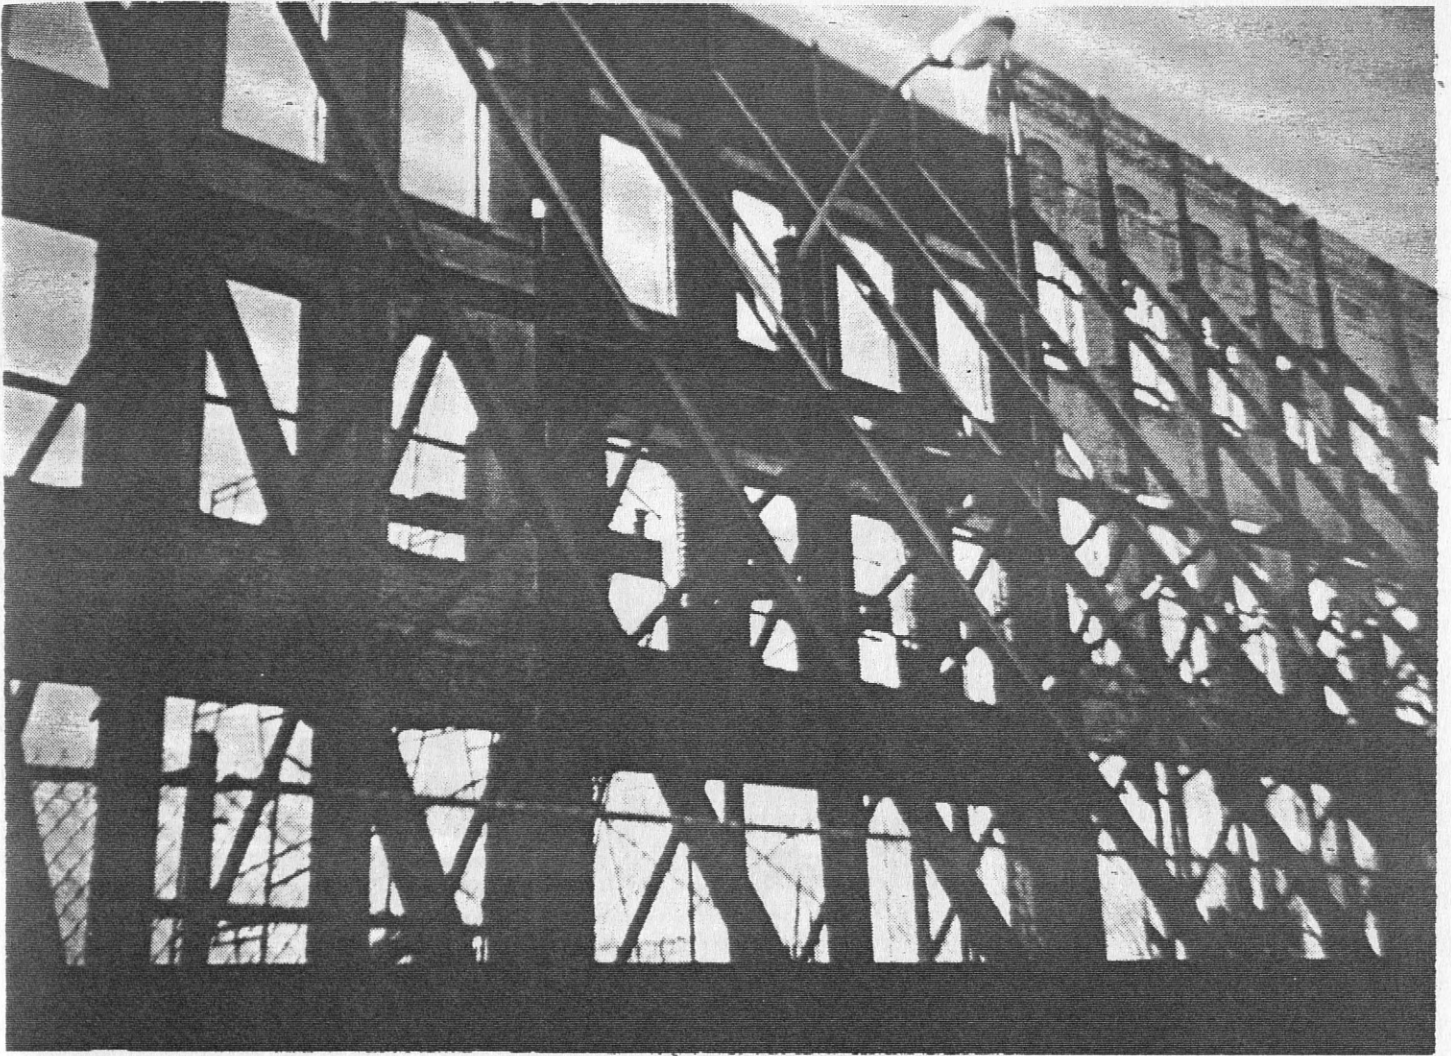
Propped Walls of Building at Beale Street During Reconstructions
